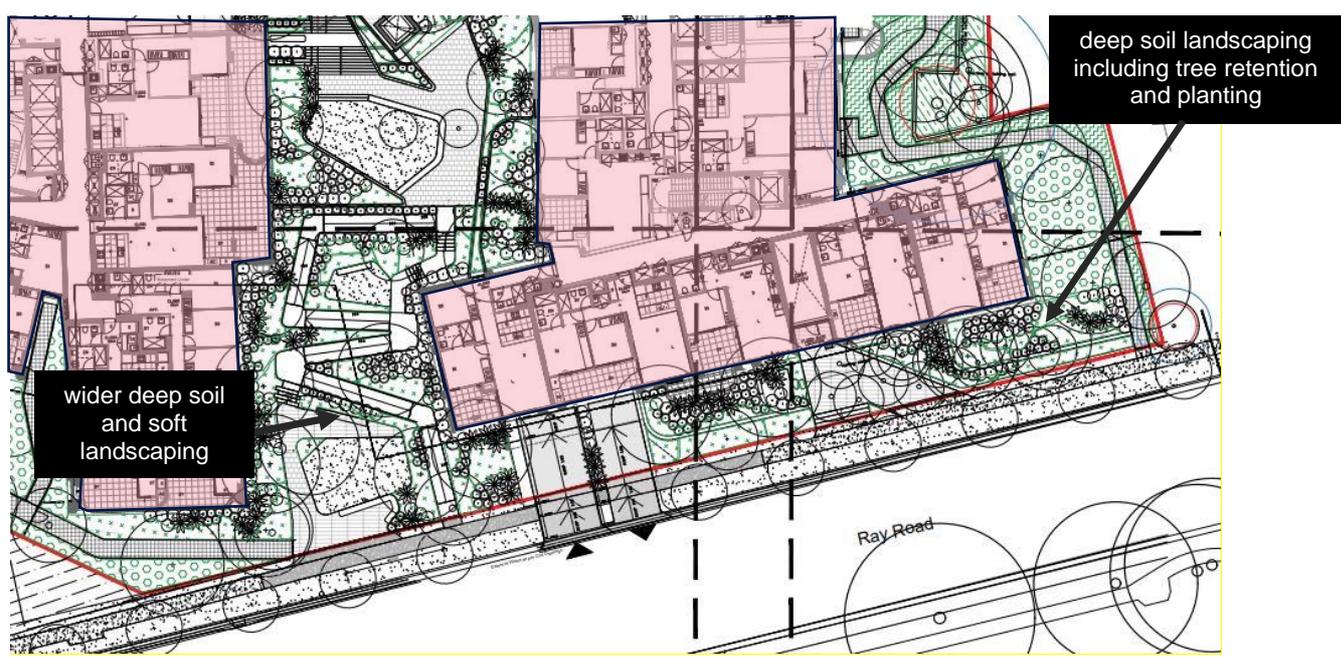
| Proposed approach to Ray Road frontage (Source: Applicant's RTS)
